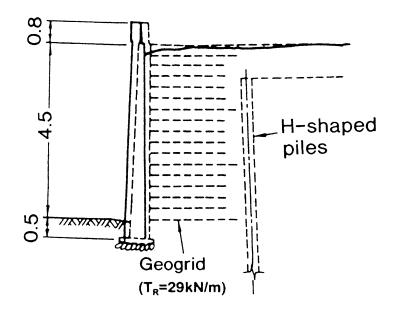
Cross section of geogrid-reinforced wall that suffered some damage (Tatsuoka et al. 1996a)
